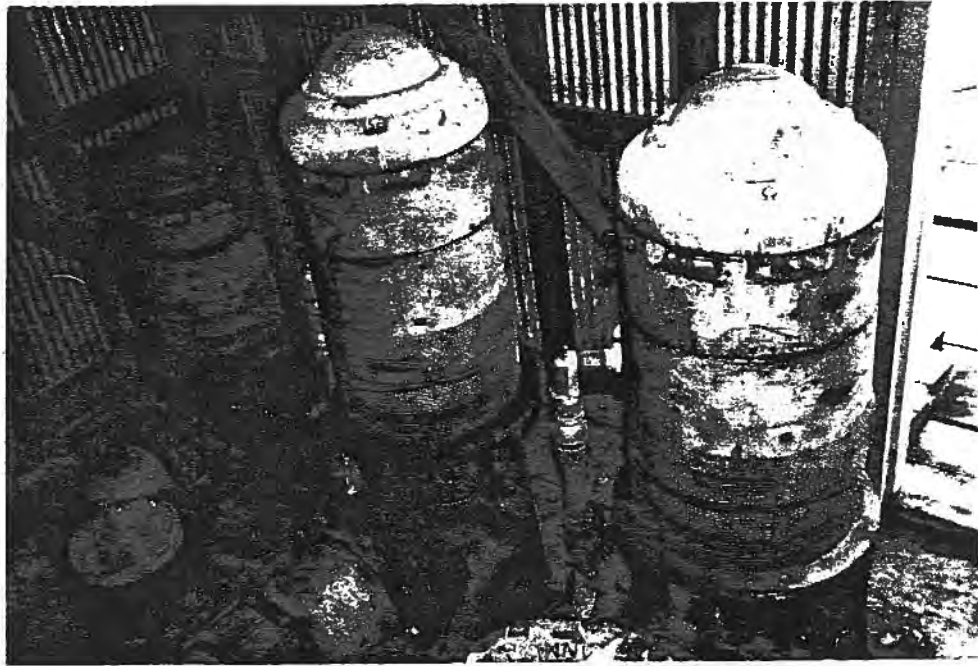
REUSE WATER PUMPS AND PUMP CHECK VALVES
